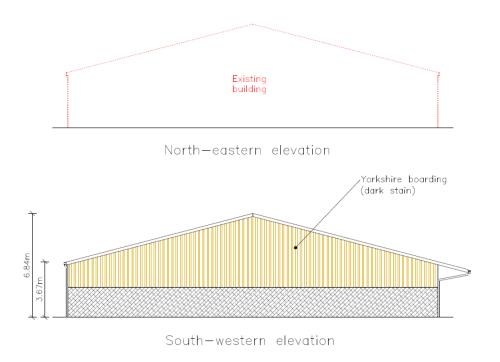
Building A – Proposed North-Eastern Elevation and South-Western Elevation
